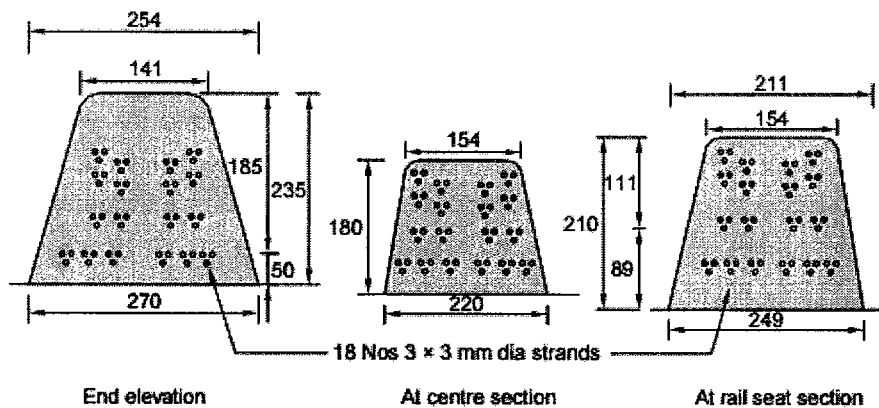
PCS-12 mono-block concrete sleeper (units in mm)
